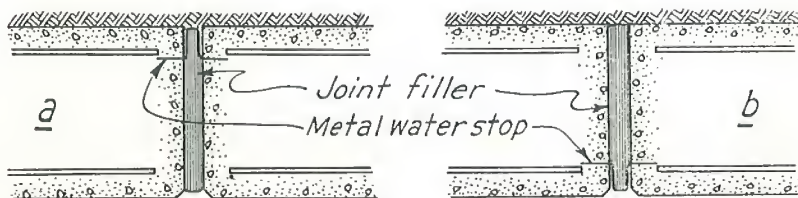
Horizontal sections through expansion joints suitable for use in abutments.
